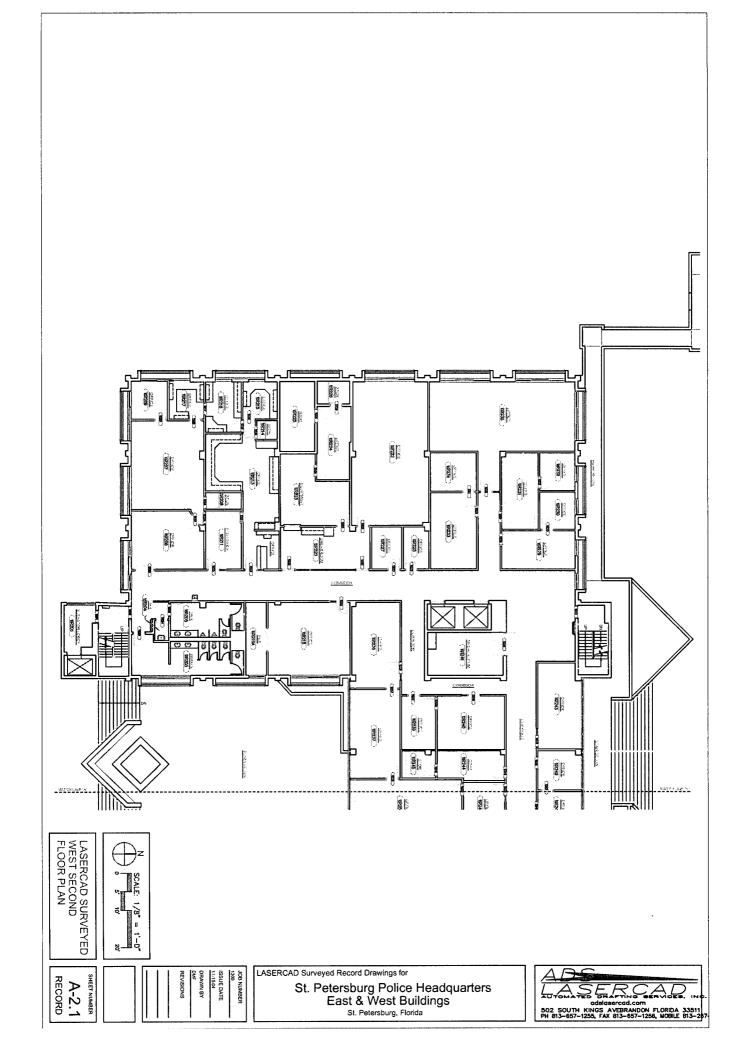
" – FLOOR PLANS [FOLLOWS]
